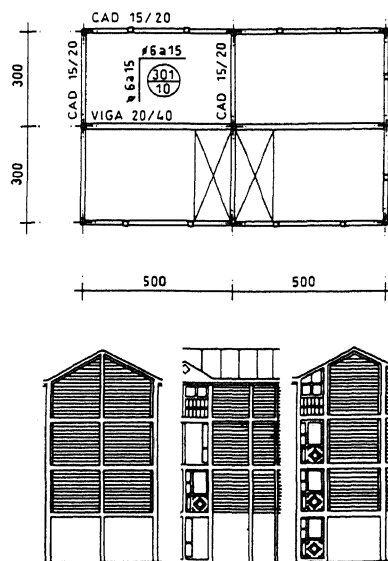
Plan view over 3<sup>rd</sup> floor and elevations
